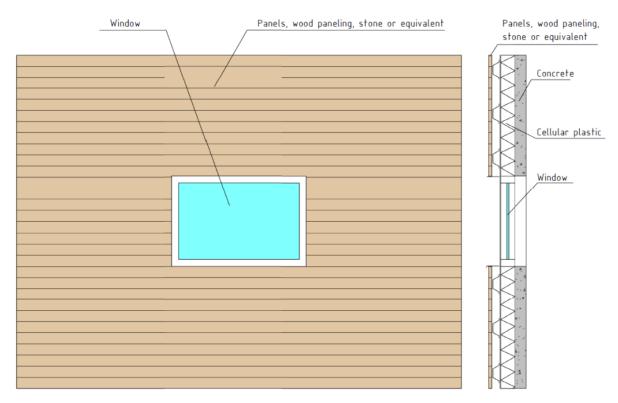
Typical design of an exterior wall with combustible insulation and panels, wood panelling, stone or equivalent.
